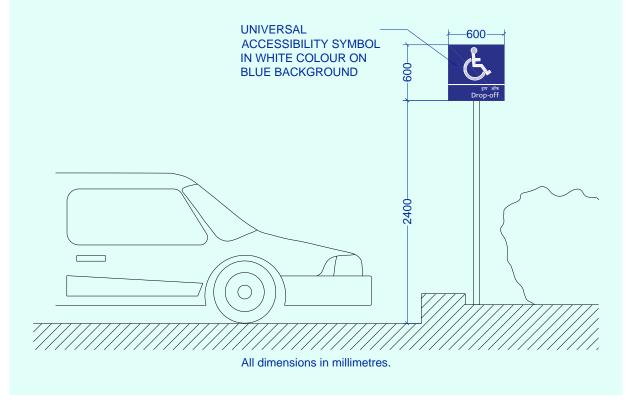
Vertical sign at City side kerb for accessible drop-off point
